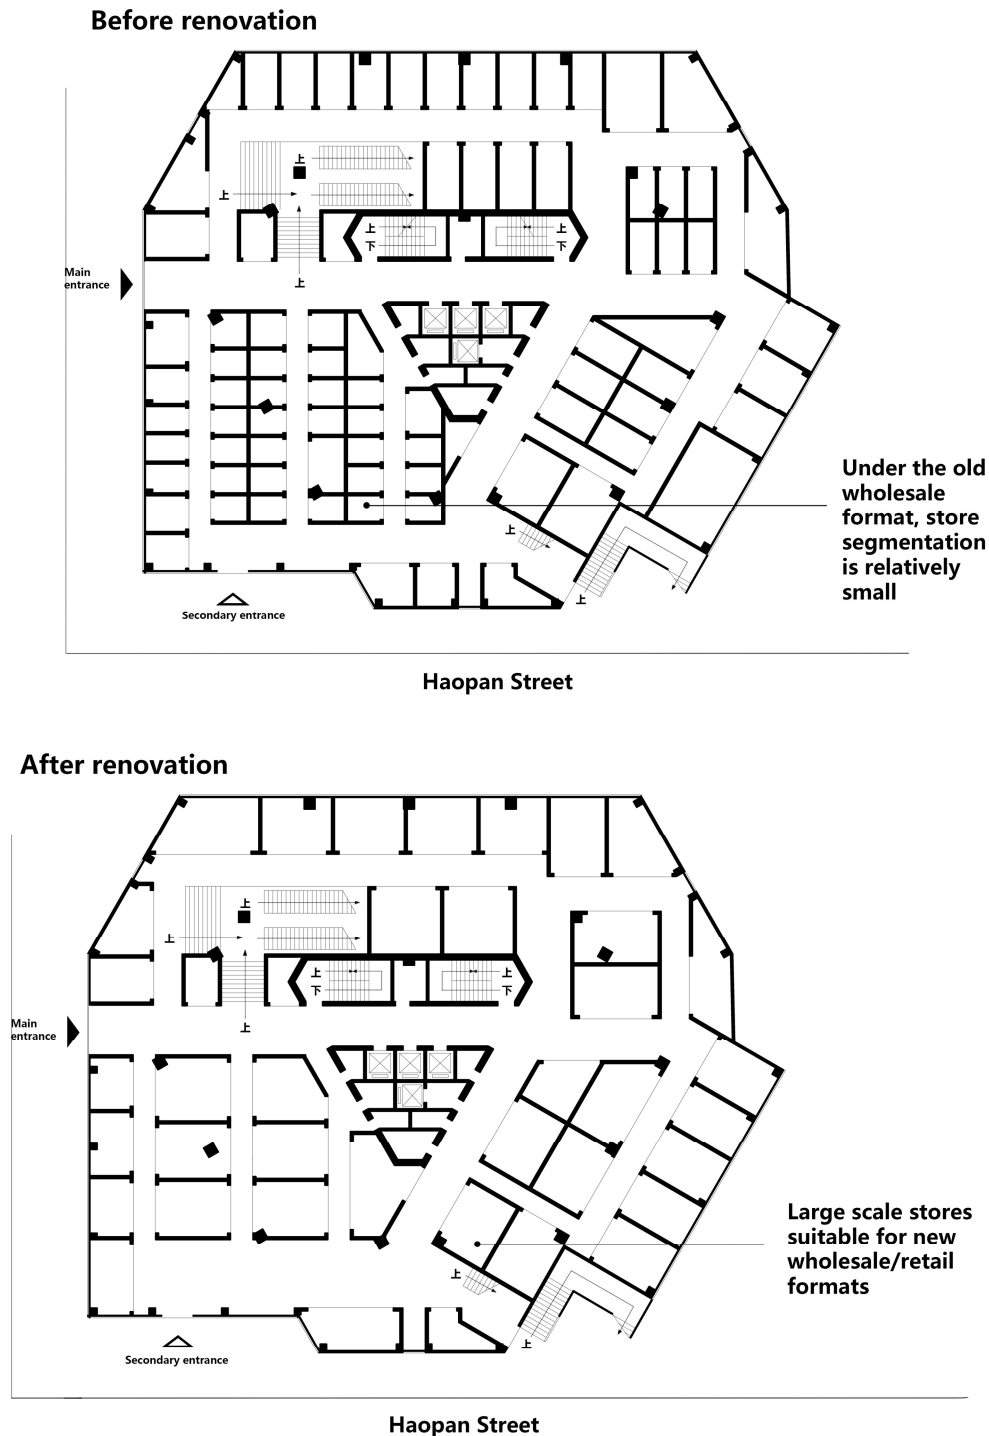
West Entrance Haopan Market Pre - and Post Renovation Plan
